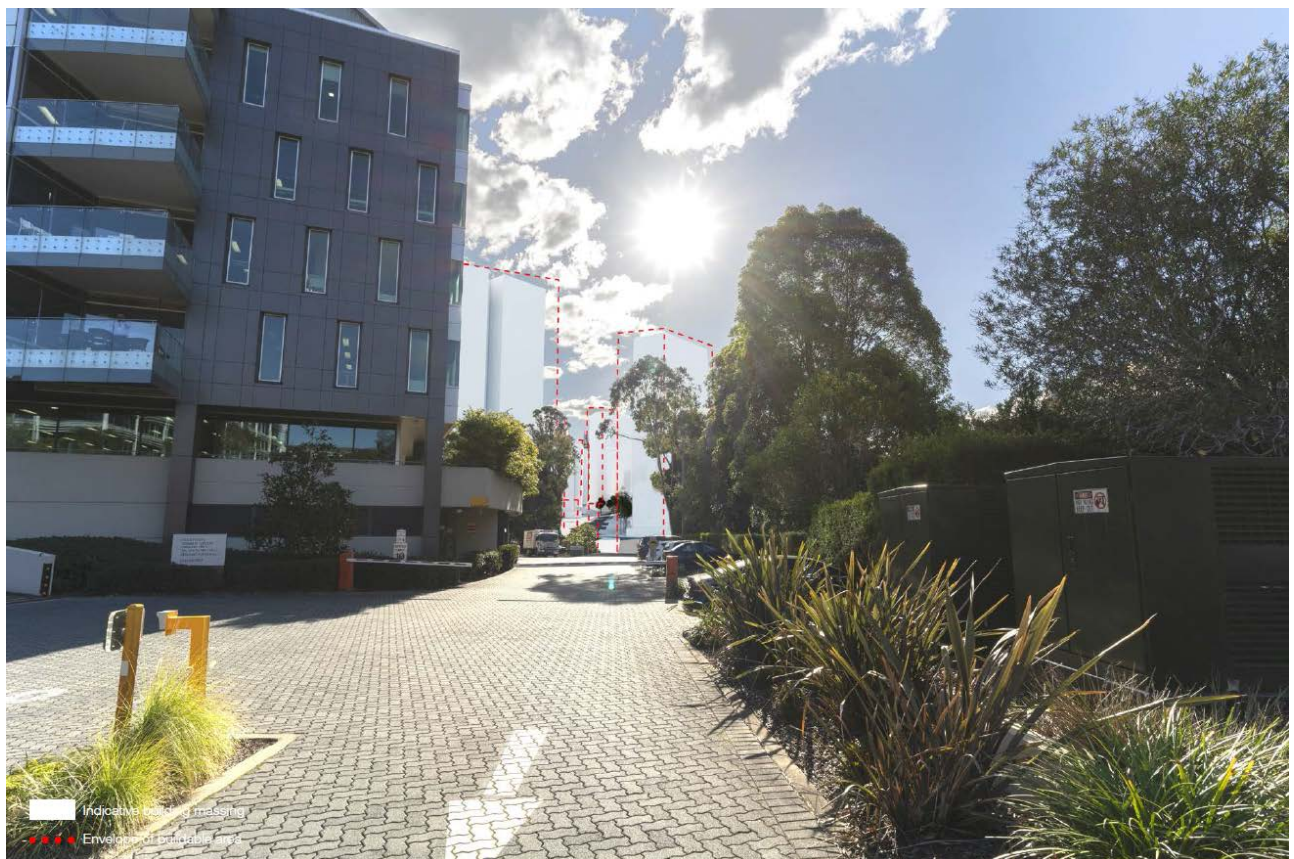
Viewpoint 9: 6-8 Lyonpark Road, proposed view
